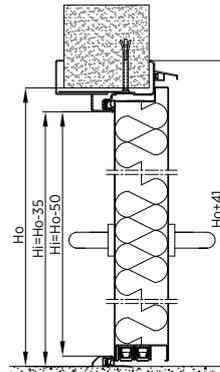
Installation of the ECO Tech single-leaf seamless door with a wrap-around frame without a thermal break to a masonry wall - vertical cross-section
